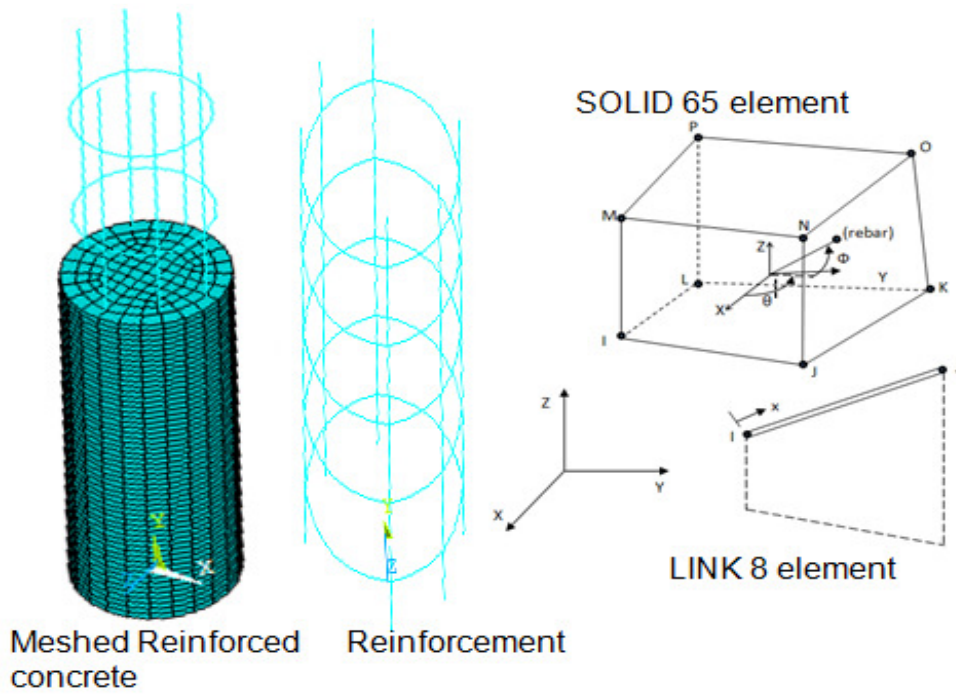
Typical details of Finite element model for reinforced concrete column
